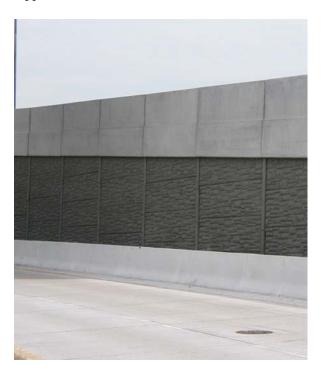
Durisol Inc., Anchored Retaining Wall – Wall/Slope, High Performance, High Appearance Wall.
